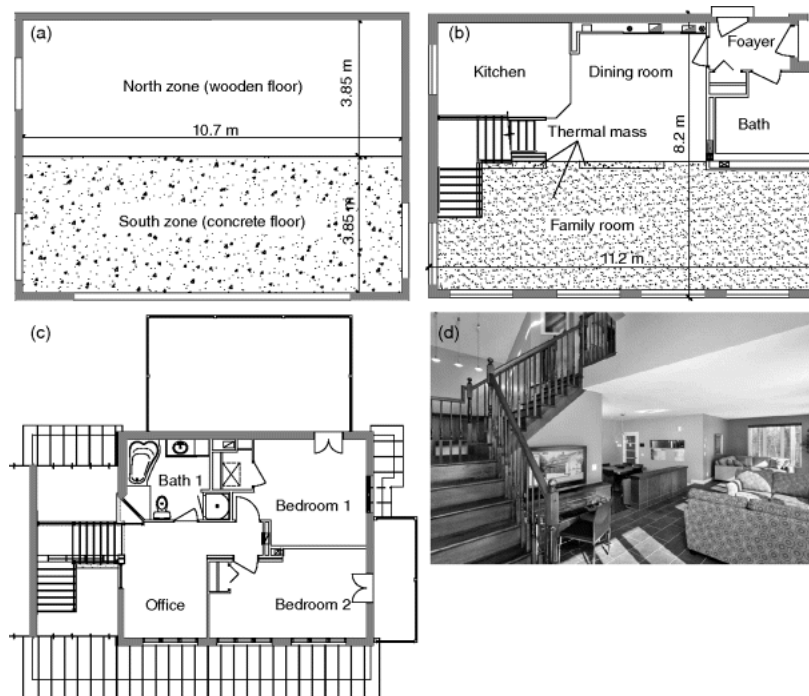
Floor plans of (a) basement, (b) ground floor, and (c) second floor; (d) photograph of interior of ground floor living space
